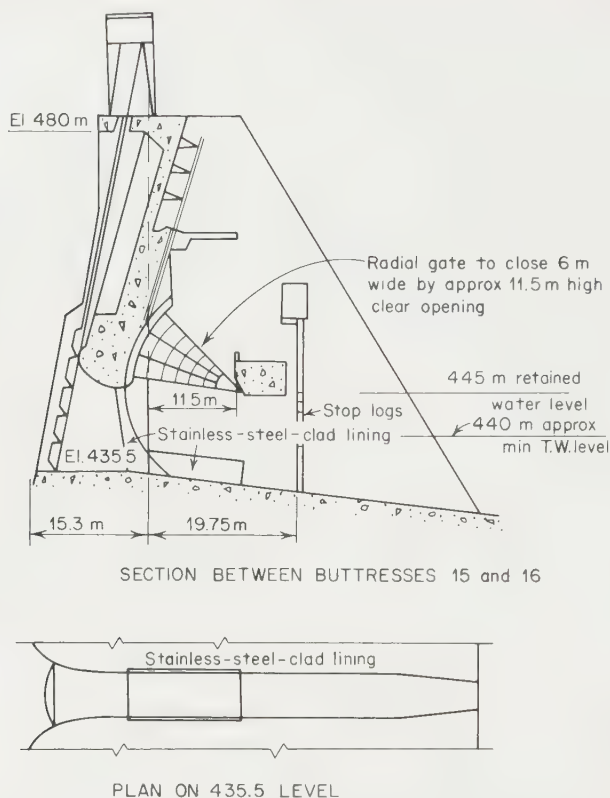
Low-level outlet, Roseires Dam, Republic of Sudan. (Courtesy of Sir Alexander Gibb and Partners, London.)
